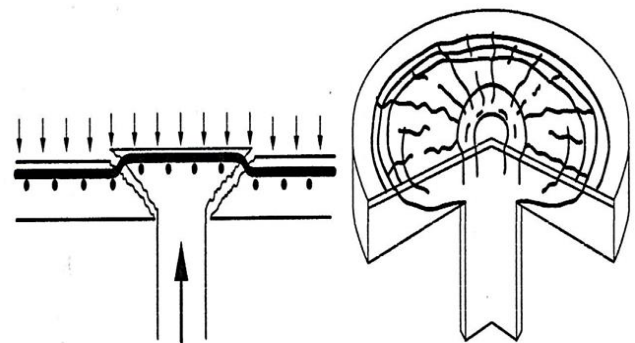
Cracking pattern and cylindrical cone of the punching shear failure
